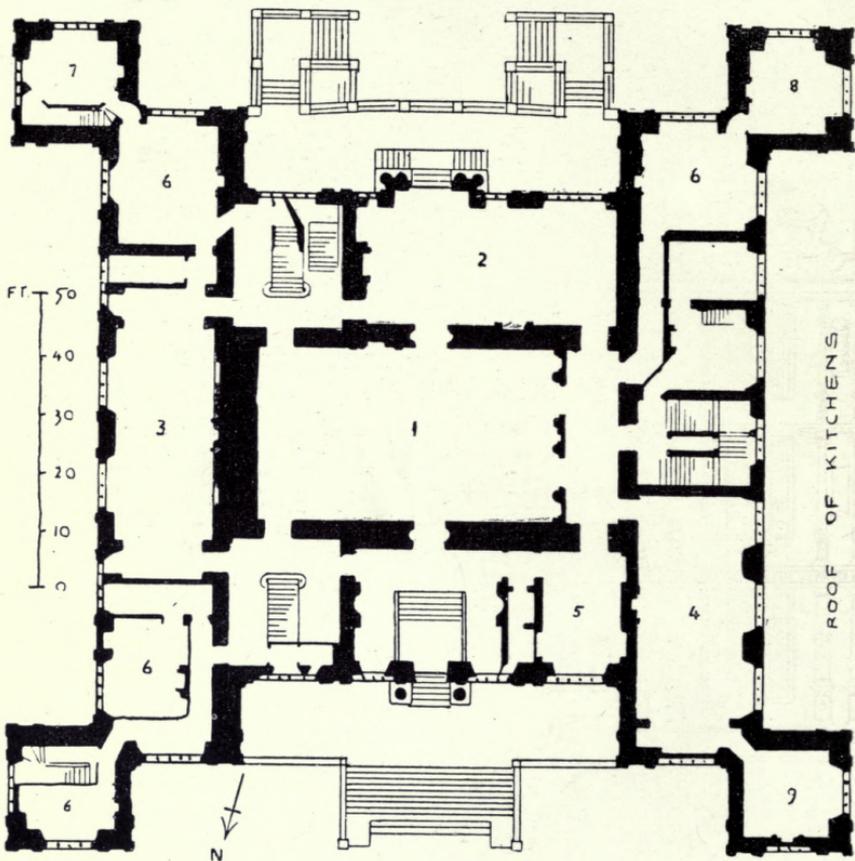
WOLLATON HALL: GROUND PLAN, 1901.
